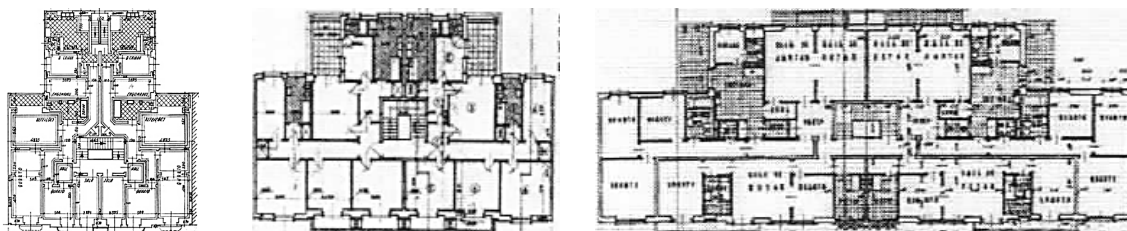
Placa buildings with the characteristic shape in plan known as 'Rabo de Bacalhau' (Costa, 1997) (Nereu, 2001).
